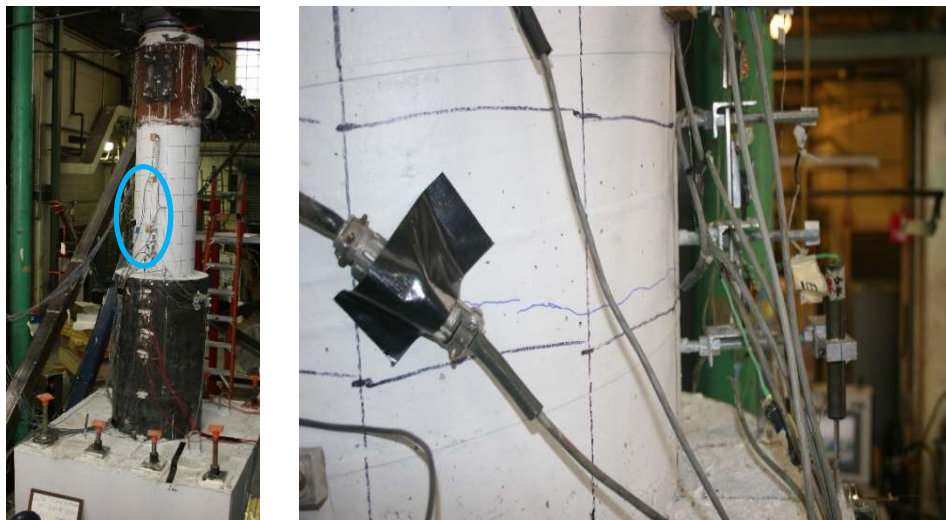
Specimen 30-21-R Horizontal Crack on Northern Column Face at 0.5% Drift
